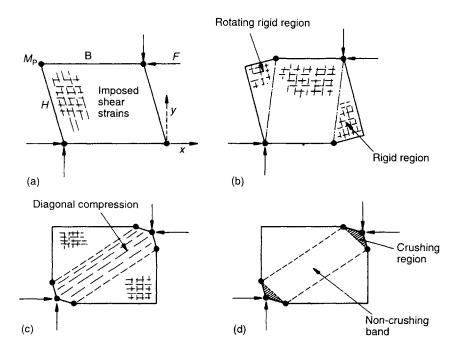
Idealized plastic failure modes for wall frame panels: (a) shear mode S (strong frame, weak wall); (b) shear rotation mode SR (medium strength walls); (c) diagonal compression mode DC (strong wall, weak frame); (d) corner crushing mode CC (very weak frame). From Wood (1978).
